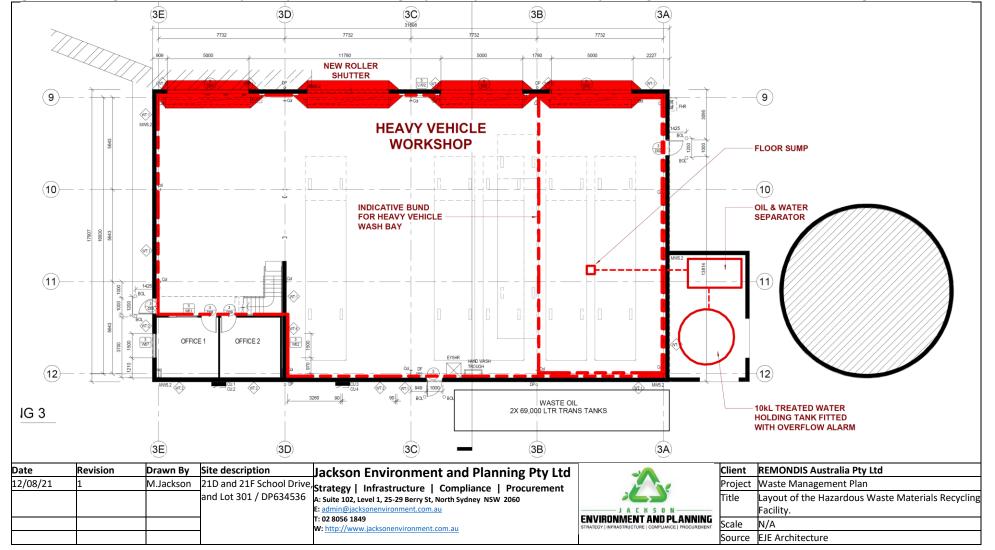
Tomago Resource Recovery Facility and Truck Parking Depot – Layout of the Workshop, noting the location of the waste oil storage tanks to the rear.
